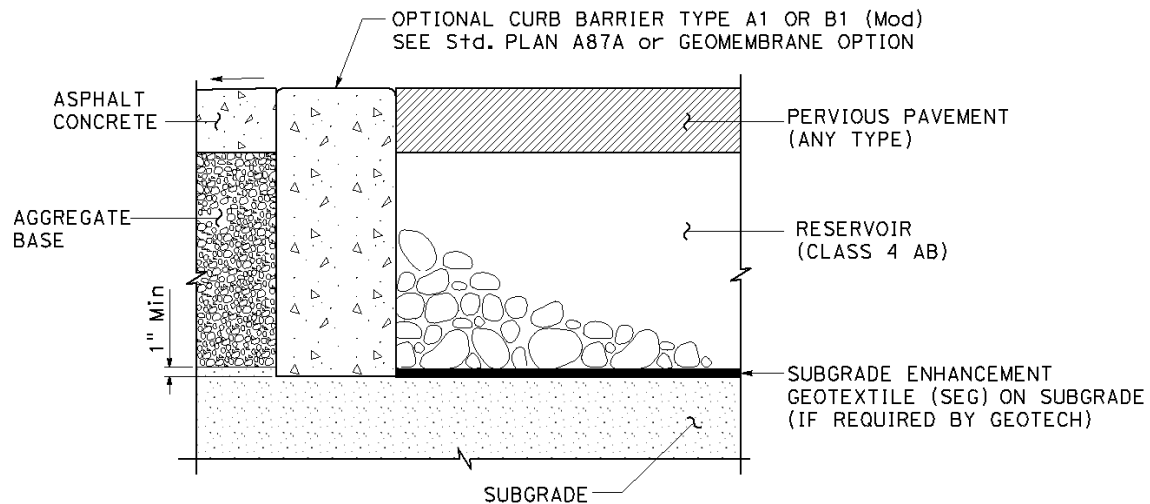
Barrier Between Pervious Pavement and Asphalt Concrete Pavement
